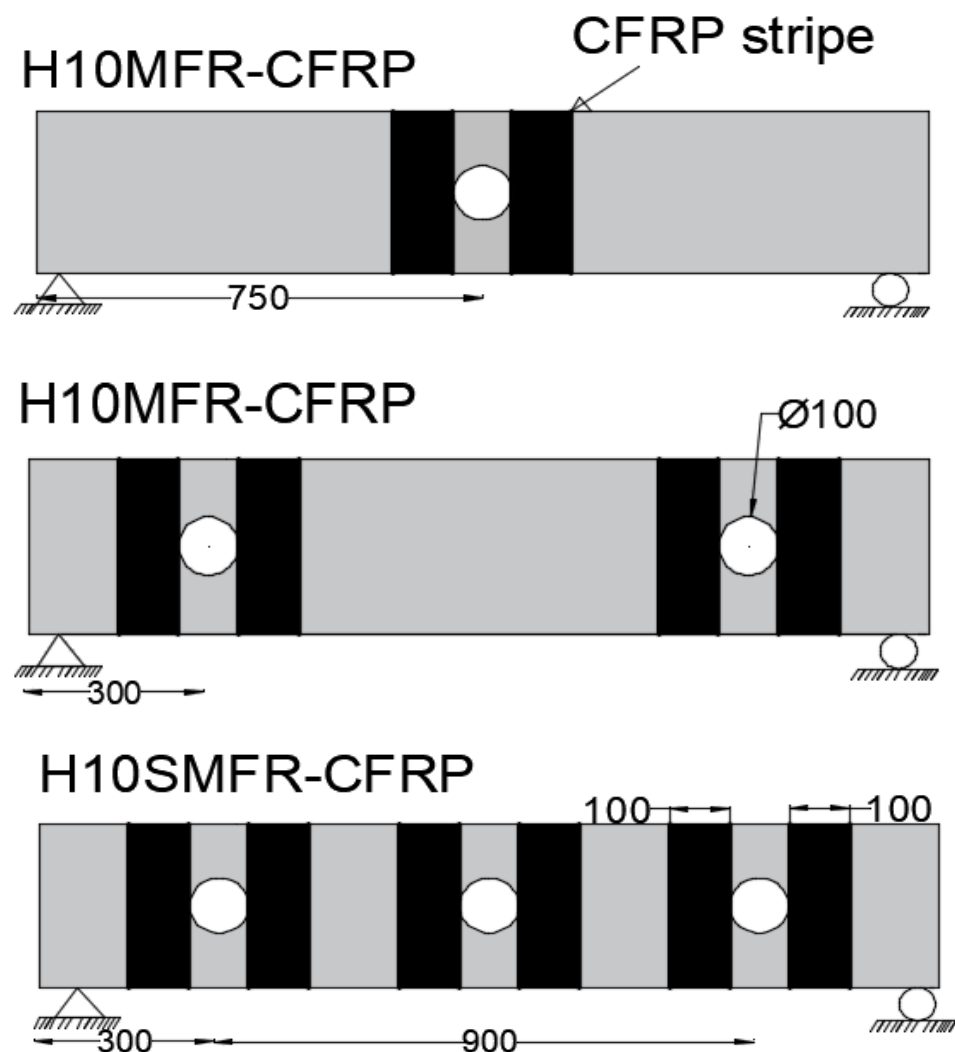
4: Full wrapping external strengthening around openings by CFRP laminates
